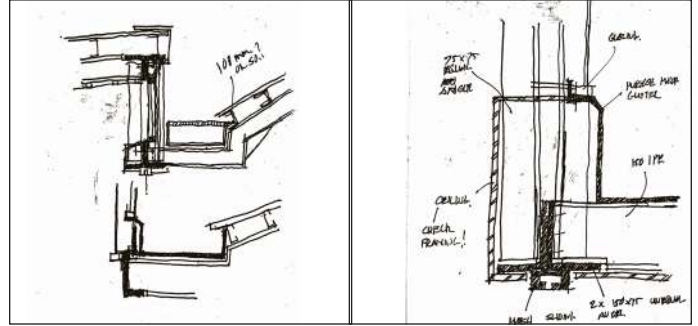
Multipurpose sports centre gutter and ceiling detailing (Author: 2019)
